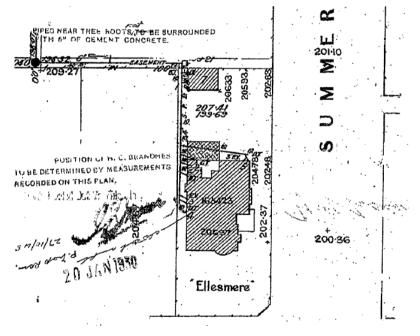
Property sewerage plan, showing the house at 152 Summerhill Road, 1930 (Source: Yarra Valley Water).
